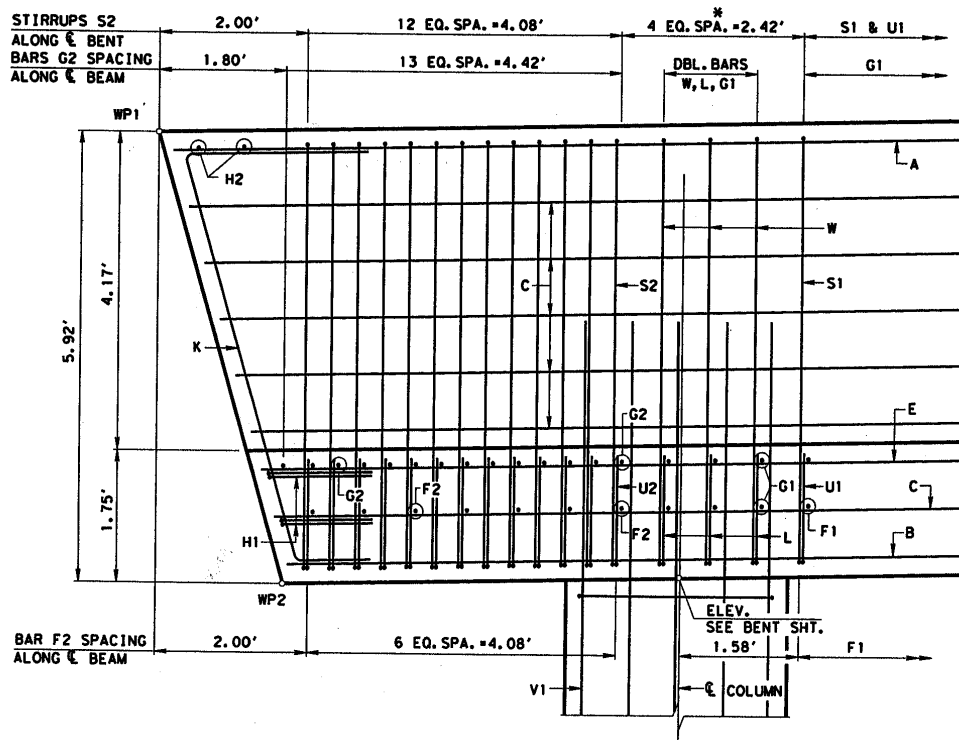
Steel arrangement in cantilever portion with skewed end face
